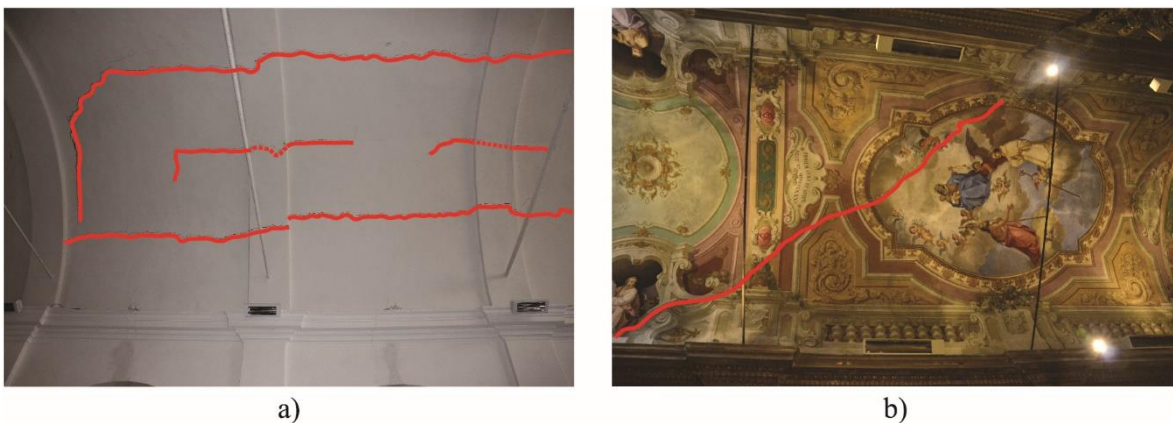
Typical cracks observed in barrel vaults: a) longitudinal cracks, b) diagonal cracks.
